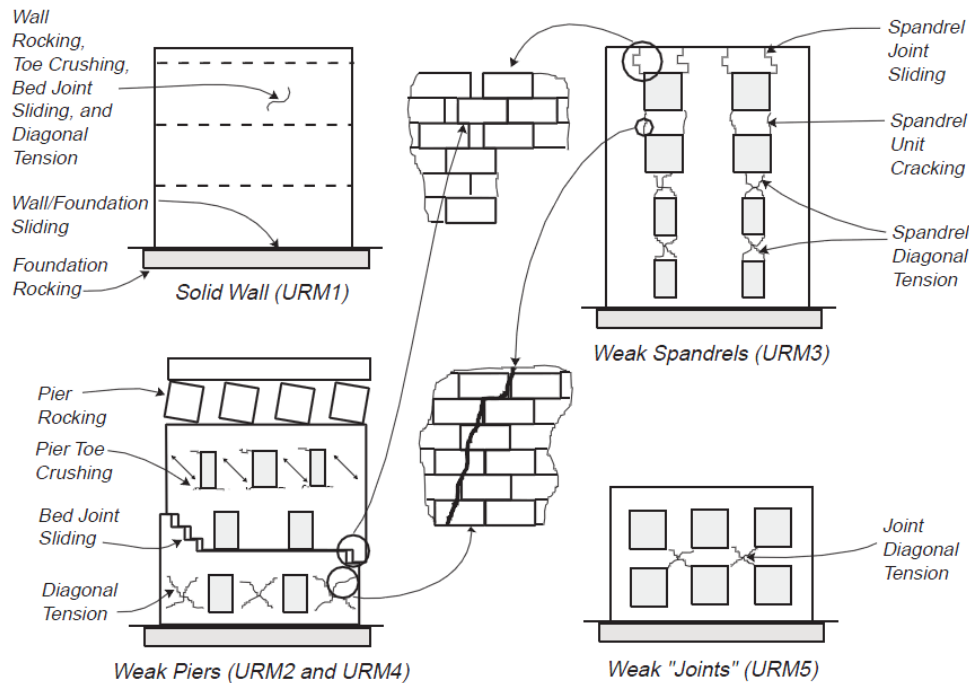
In-plane behaviour of masonry walls (FEMA 306 1998).
